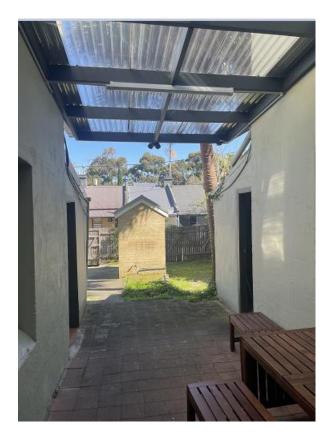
Ground floor rear wings of Nos. 195 (left) and 193 (right), noting 193 and 195 Harris Street share a communal open space at the rear
